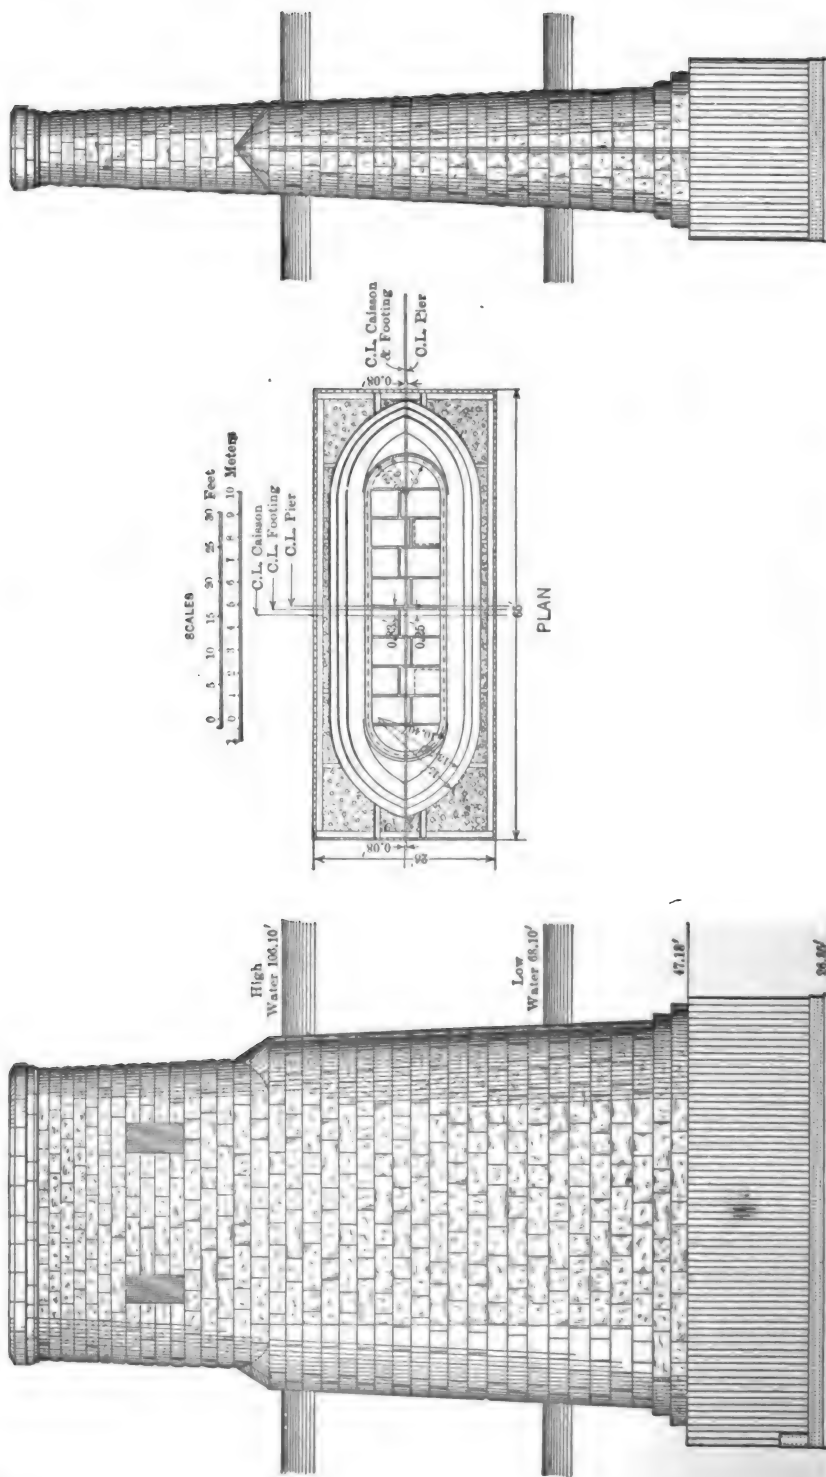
MCKINLEY BRIDGE CHANNEL PIERS.
